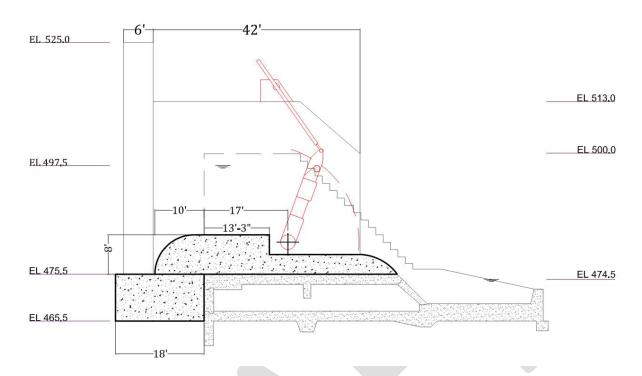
TP-4 (Lake Placid) Spillway Section
